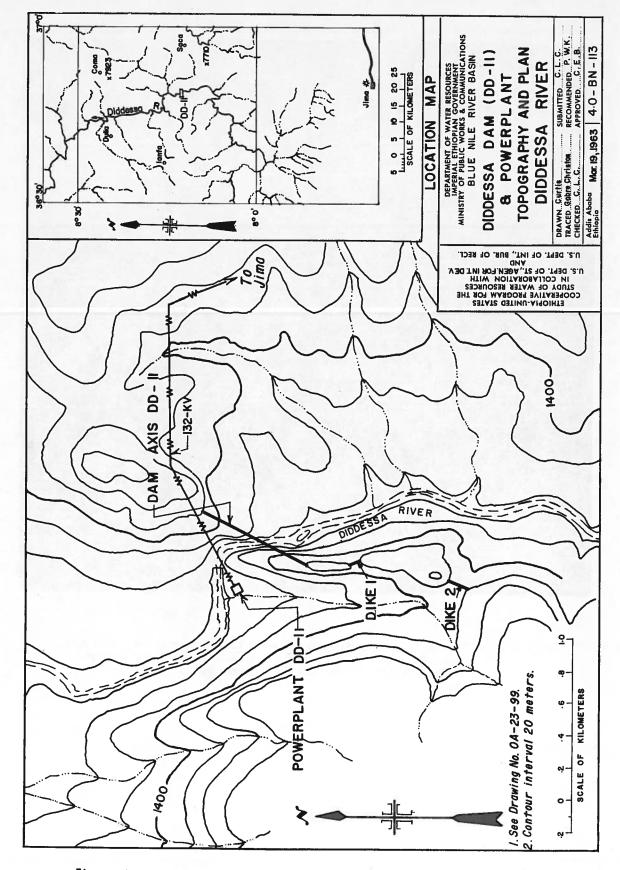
Diddessa Dam (DD-11) and Powerplant--Topography and Plan
